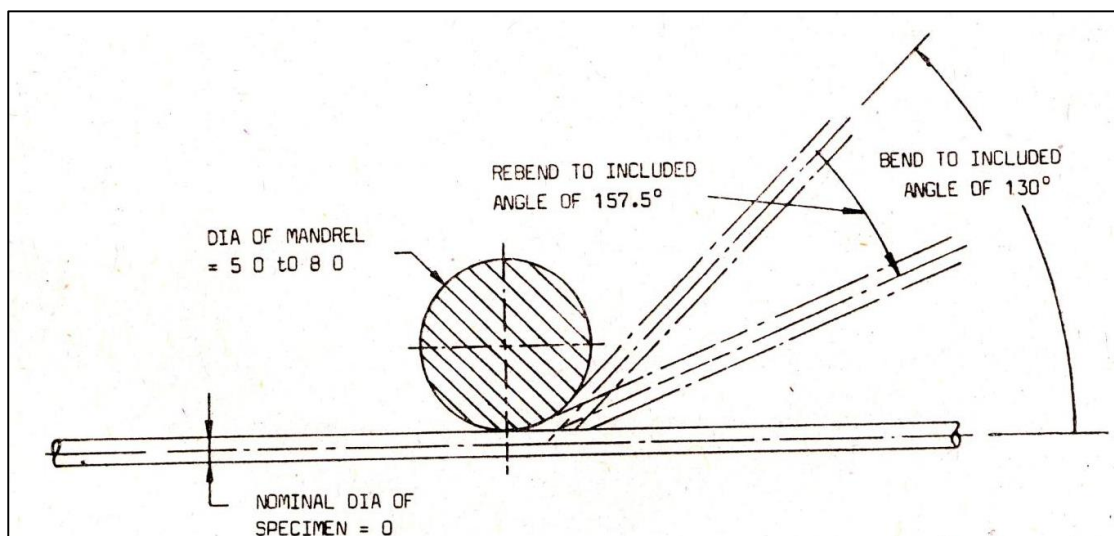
Re-bend test procedure (NS:191, Fig.2)
